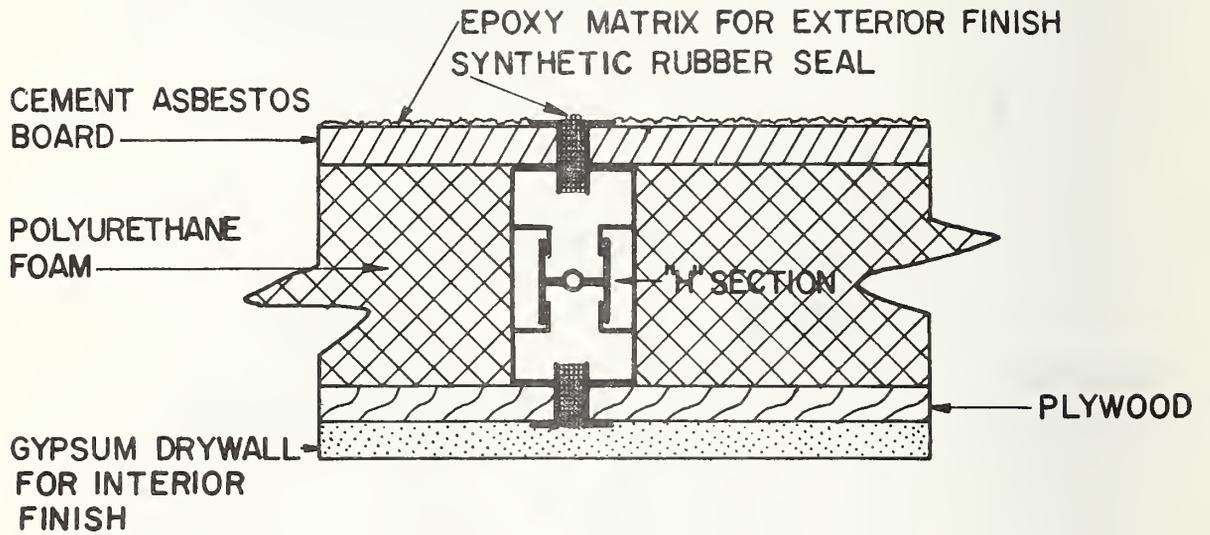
VERTICAL CONNECTION IN WALL PANEL SYSTEM
